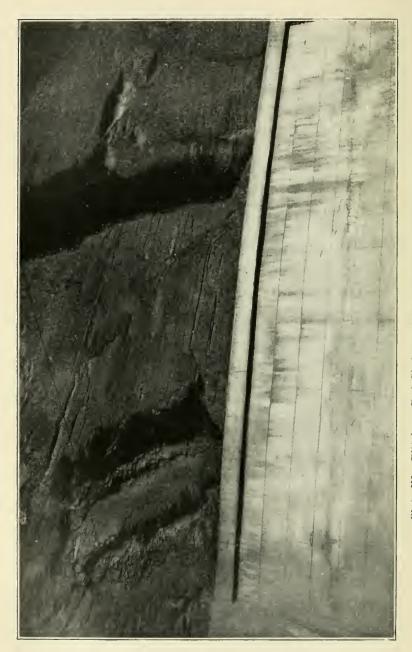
Plate XI.—Pittsburg Red Shales and Retaining Wall at Middle Ferry, Brooke County.
